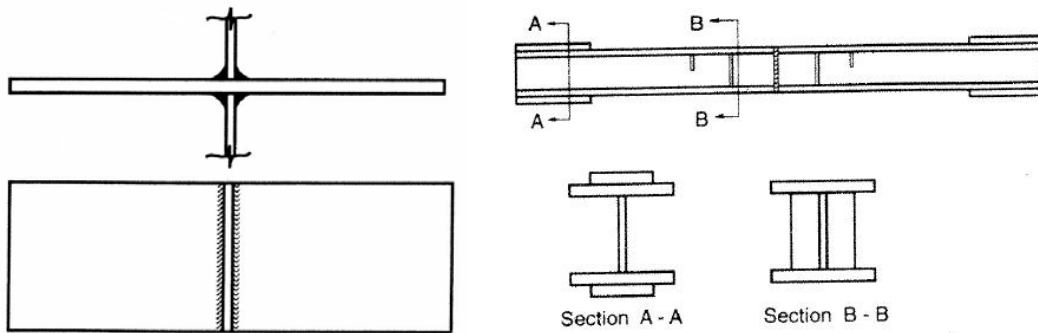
Small-scale cruciform joints (left) and full-scale beam specimens (right)
